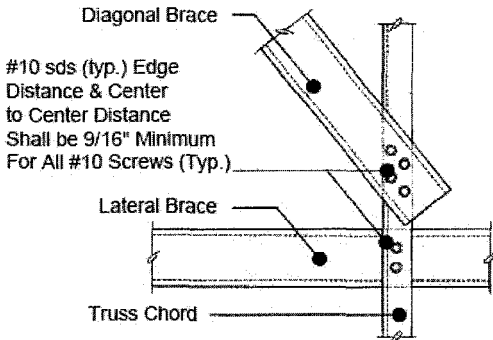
Typical Brace Connection (LGSEA 1998a)
